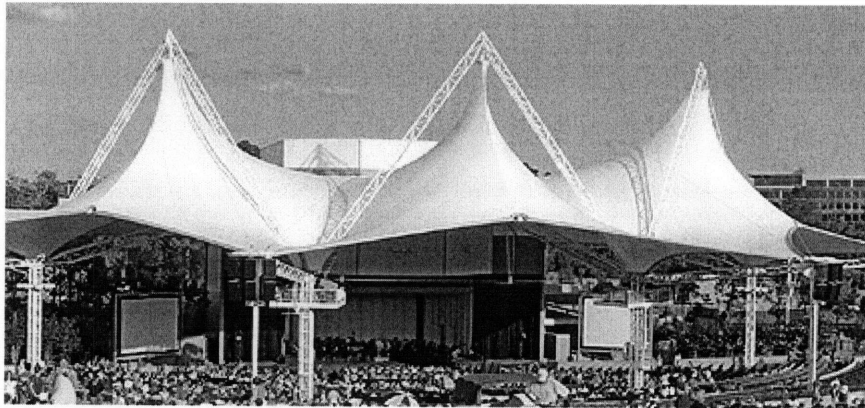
A-frame Supported Structure: Mitchell Performing Arts Center (Berger, 1999)
